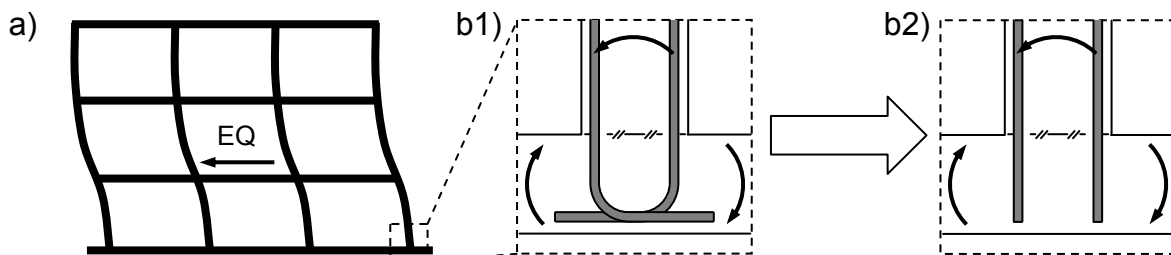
Column-to-foundation connection: a) Moment resisting reinforced concrete frame structure; b1) Anchorage with hook; b2) Anchorage without hook (after Mahrenholtz, C.; Eligehausen, R.; Hofmann, J. (2011))
